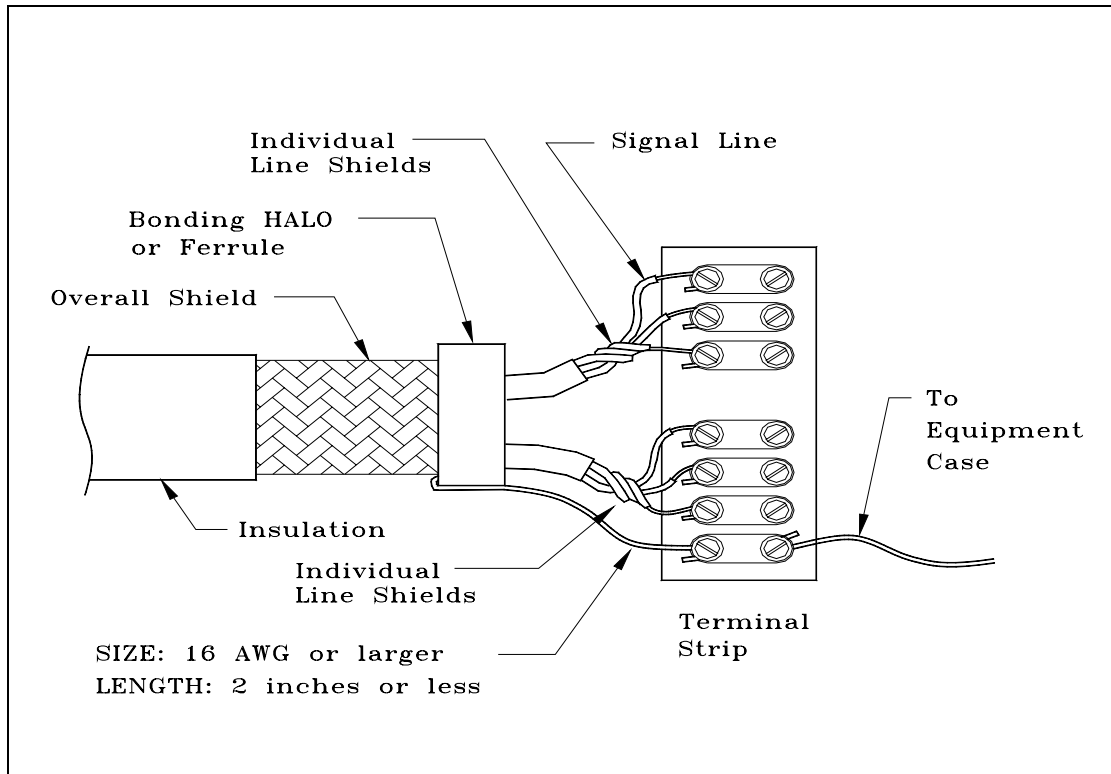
Figure IV. Grounding of Overall Cable Shield to Terminal Strip
